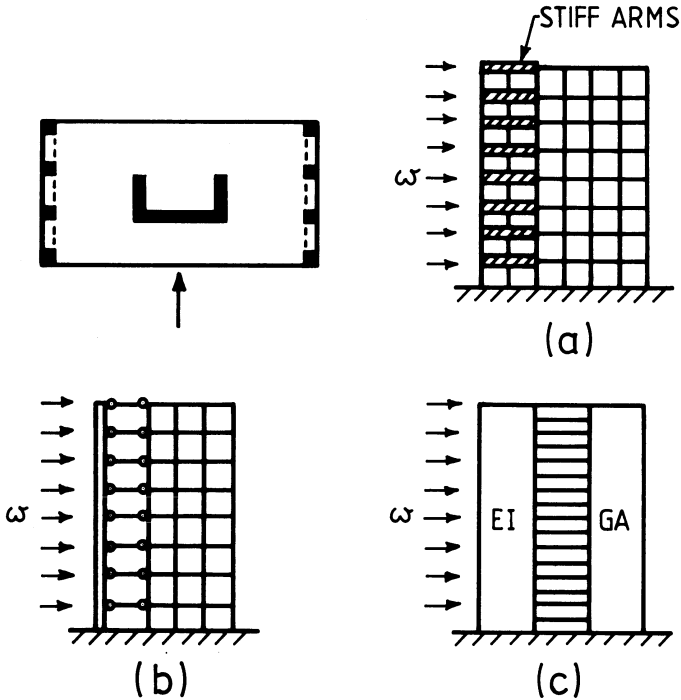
Planar representations of idealized wall-frame structure: (a) wide-column model for wall; (b) linked wall-frame model; (c) continuum model, with frame modeled by equivalent shear cantilever
